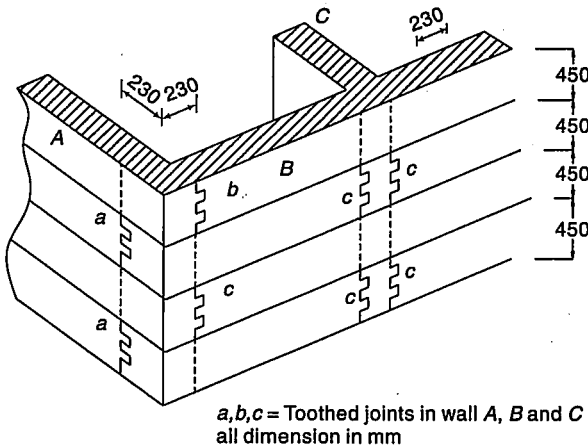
Alternating toothed joints in walls at corner and T-joints
